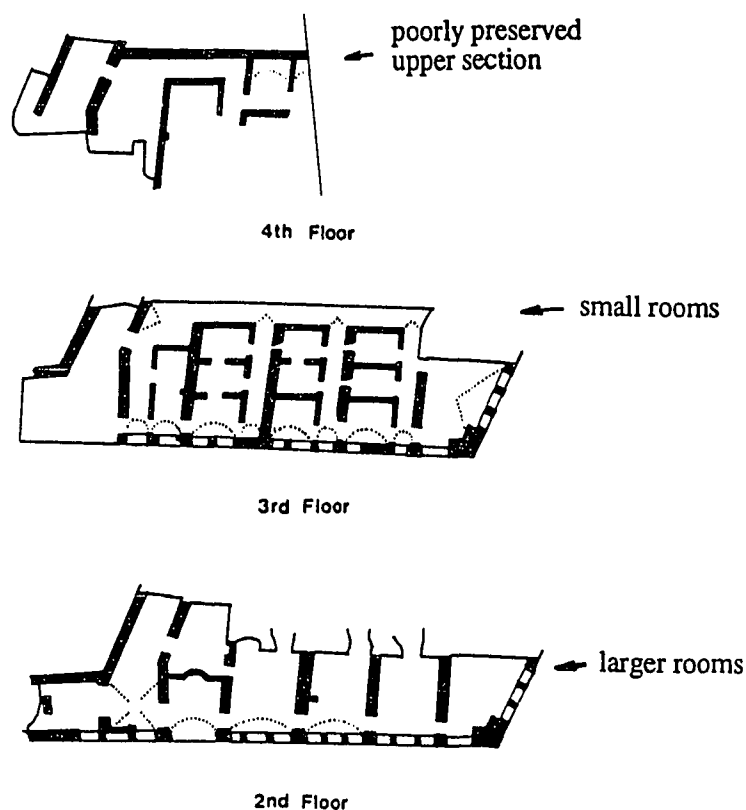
Plans of the partially-preserved side of the ancient apartment building on the Via Giulio Romano (the "Aracoeli apartment"). The ground floor was devoted to tabernae, as seen so frequently on the Marble Plan. The second floor contained apartments with spacious rooms, while the third floor contained smaller apartments with small rooms, which may have been let independently or in groups. The fourth floor is not preserved well, and was probably built of less substantial materials (especially wood); in the uppermost floors of insulae were found the smallest rooms, "cellae," cheaply built and individually let. The Aracoeli apartment supports the image of insulae derived from Roman literature, and assists in reconstructing the nature of Rome's dwelling structures above the ground floor level. (Stambaugh (1988), Fig. 18)
